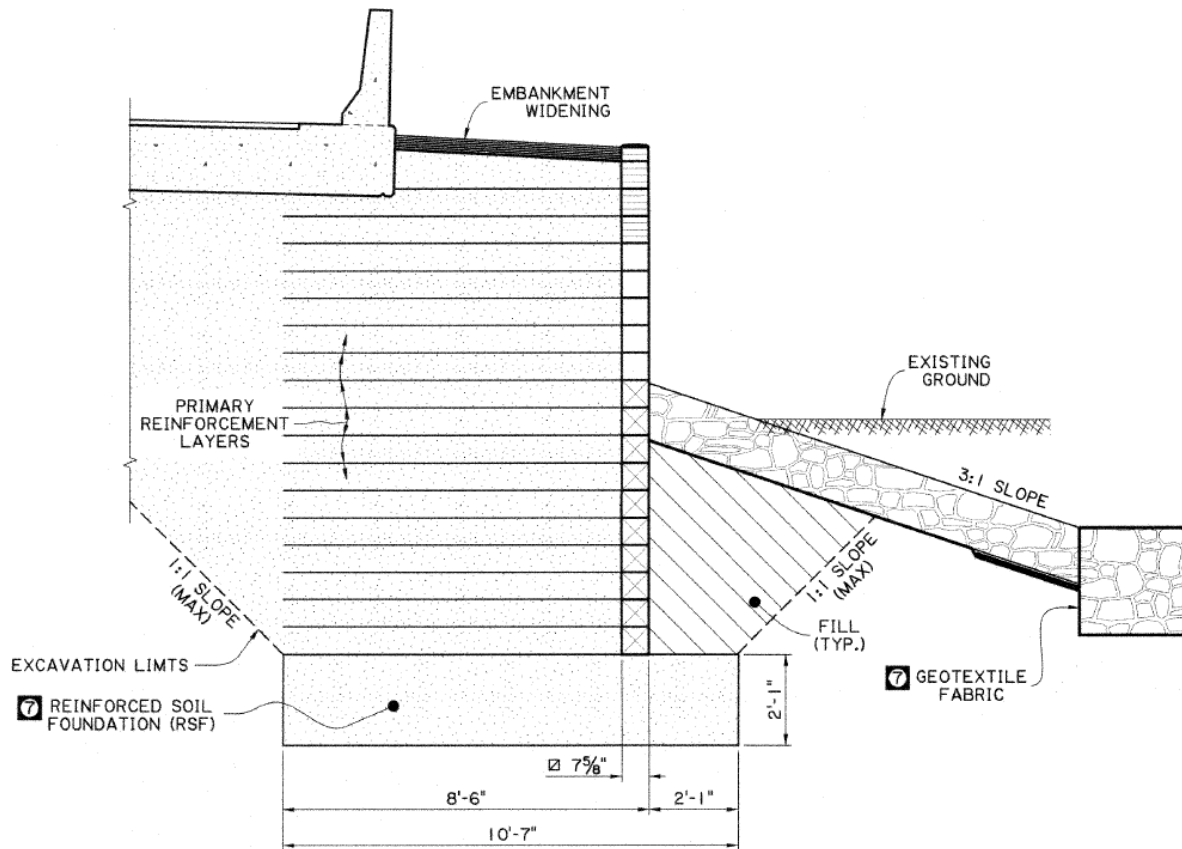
Diagram. GRS abutment wingwall section view of Unnamed Creek Bridge.
